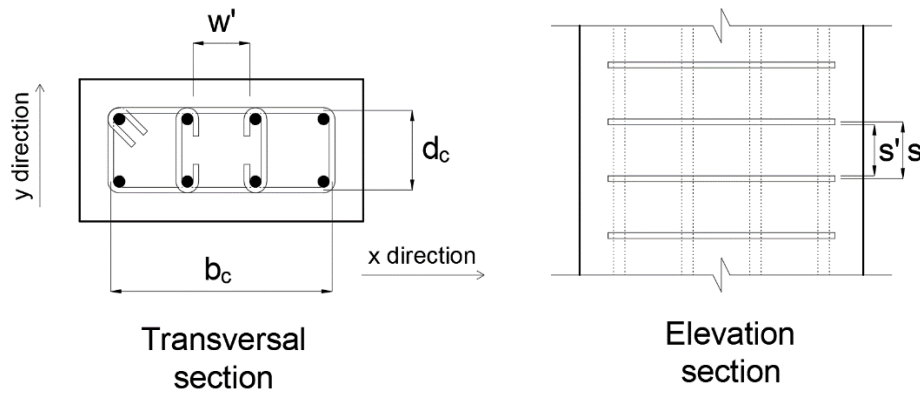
Confined concrete in a structural element with rectangular cross section.
